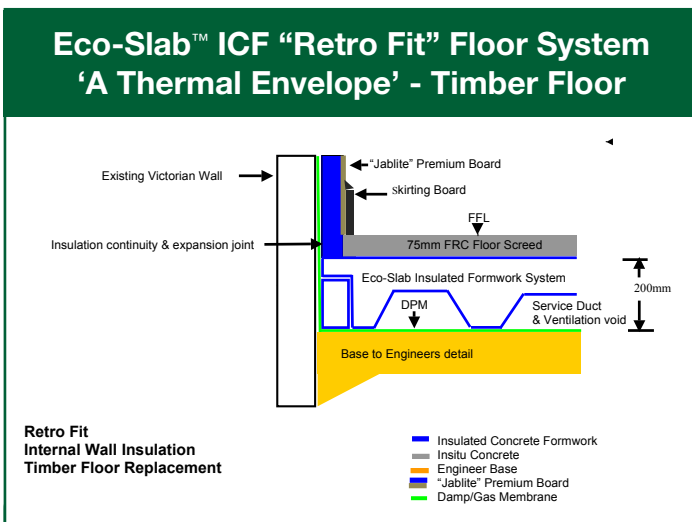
Illustrates how Eco-Slab™ and the wall insulation are contiguous, creating a “Thermal Envelope” with no cold bridging.
